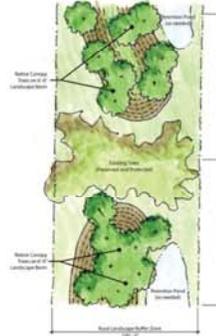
Recommended 100 Foot Rural Enclave Section View Option 1
